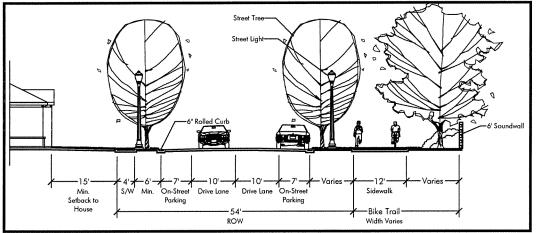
Neighborhood Street at Parkway - Woodbridge by Del Webb, Section D
